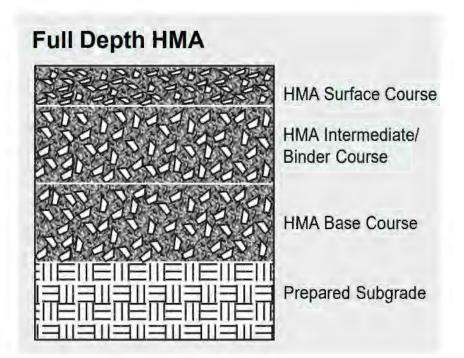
Typical design of a road structure as per FHWA HMA Pavement Mix Type Selection Guide
